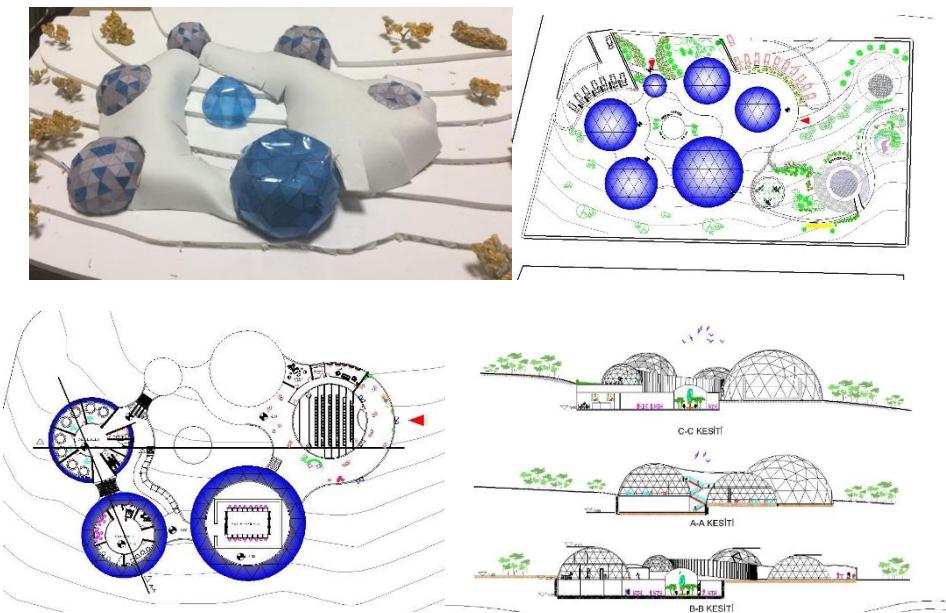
The questionnaire form VI: The model, the layout plan, the interior plans and the sections of Project VI
